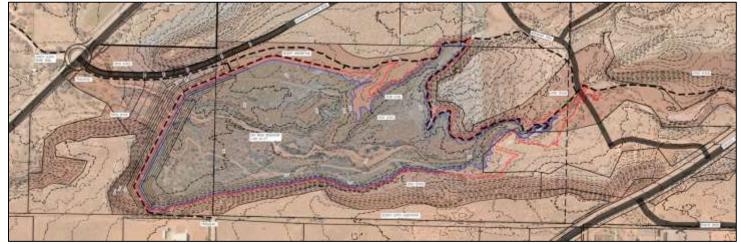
New proposal for the reservoir showing proposed open-space with trail system. The trail system (dashed black line) and open-space (darker brown shading) can be accessed from Kwavasa Drive, Old Hwy 91, and Center Street, making it readily available to all lvins residents. The fetch within the exposed western slope is significantly reduced, and could be further minimized by establishing man-made levees that would break up the area into smaller sub-basins.
